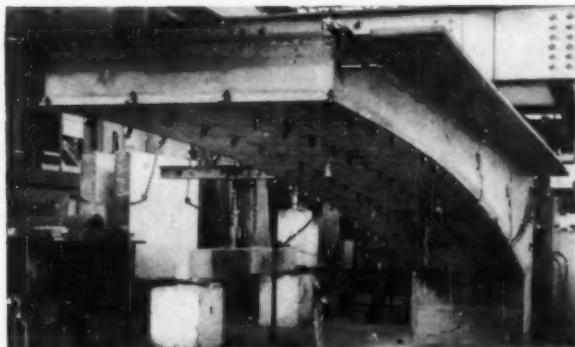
Model of a Cantilevered Beam for the Medway Bridge.
